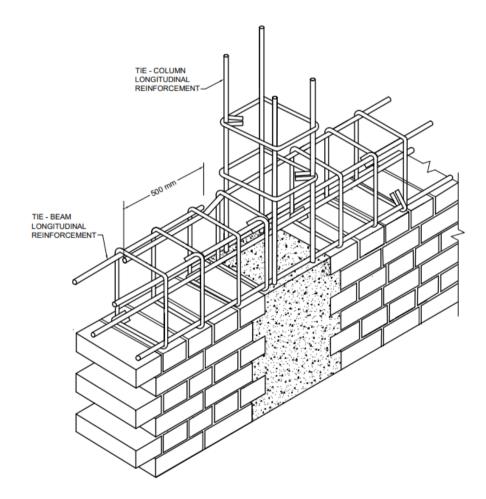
CONTINUITY OF TIE-BEAM REINFORCEMENT THROUGH JOINT
